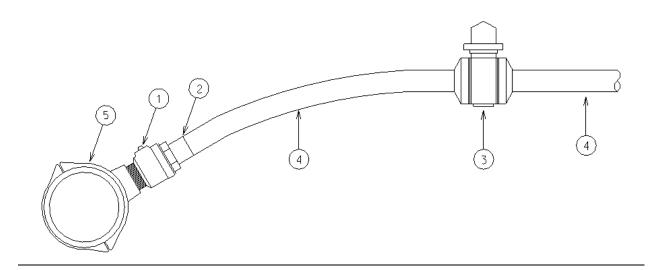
d: Main Connection – 2 inch HDPE to 6-12 inch PVC
